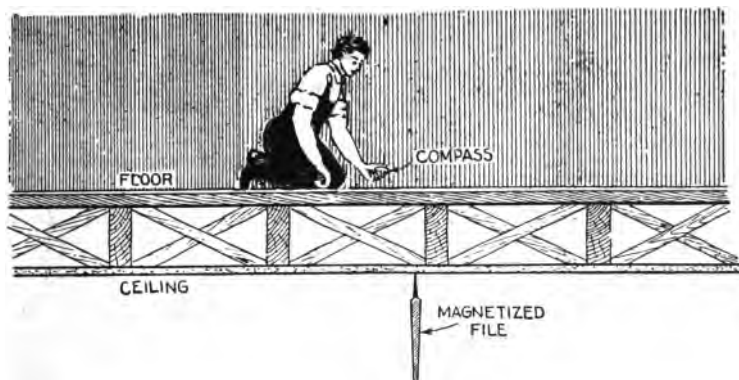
,275.—Method of locating outlet with a compass. A strongly magnetized file is placed at the point selected for outlet, then by exploring on the floor above with a compass, the needle will be agitated when moved directly over the file.
